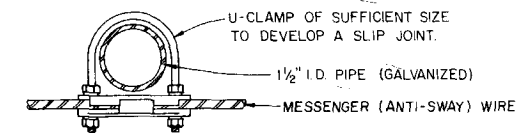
DETAIL / OPPOSING SIGNS ON SINGLE DROP PIPE
